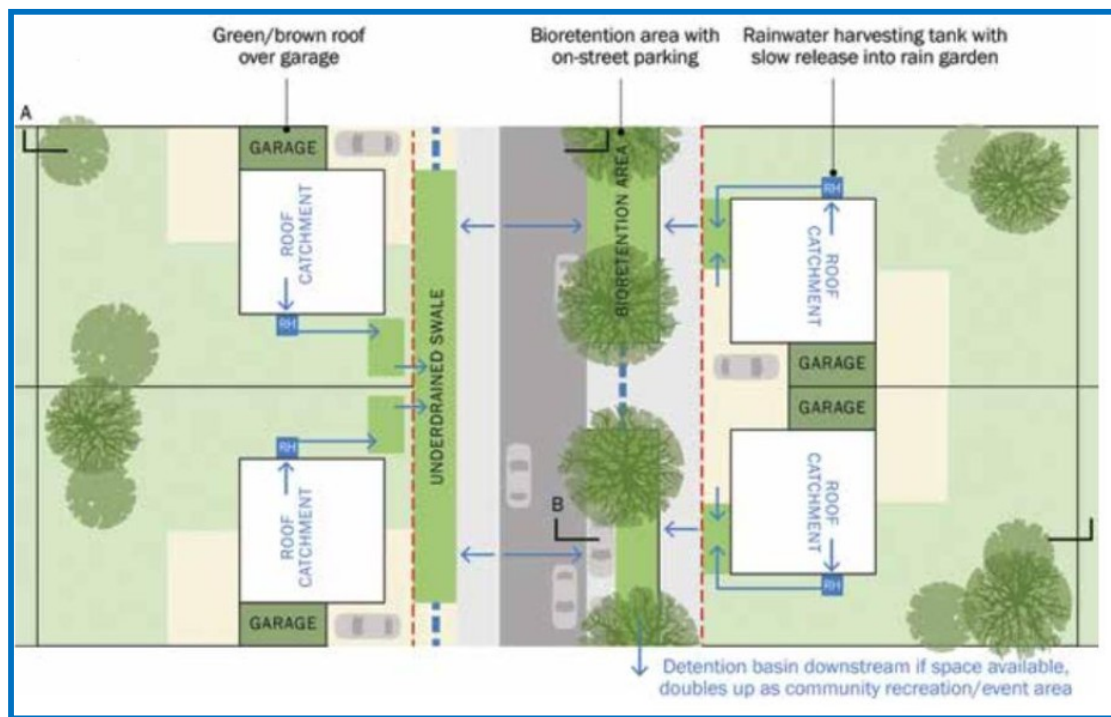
Typical Swale and Bioretention site layout incorporation.
